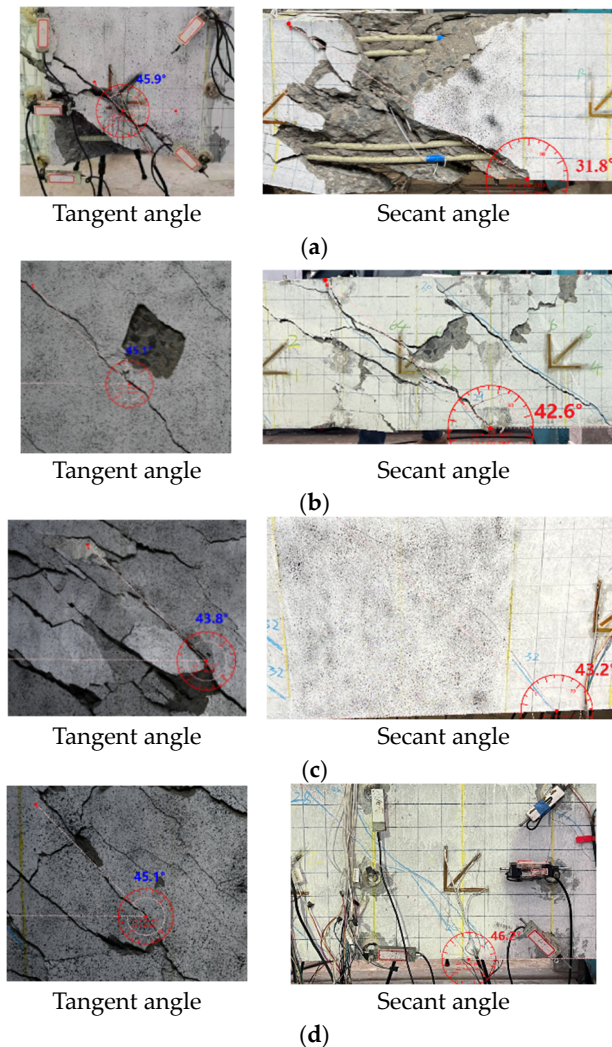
Cracking patterns of specimens at failure: (a) G-W-12D16-T; (b) G-160-12D16-T; (c) G-80-12D16-T; (d) G-80-12D19-T.
